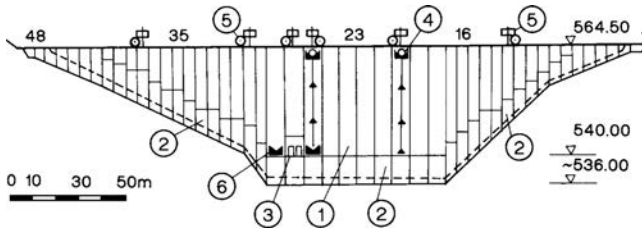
Longitudinal section of Falkenstein dam (Girod et al., 1994). (1) Reinforced concrete wall; (2) concrete block (foundation); (3) access to the complex structure for overflowing of water; (4) plumb line well; (5) measuring points for aligning and leveling; (6) drainage pipes for seepage water.
